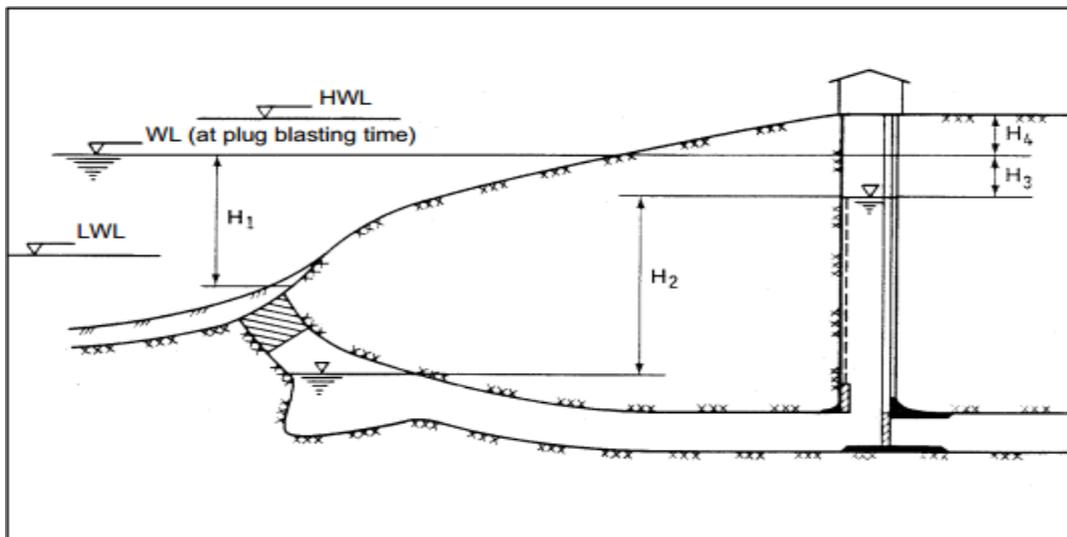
Open System Piercing, Geometric layout of intake Source: (Bruland, 2000)
